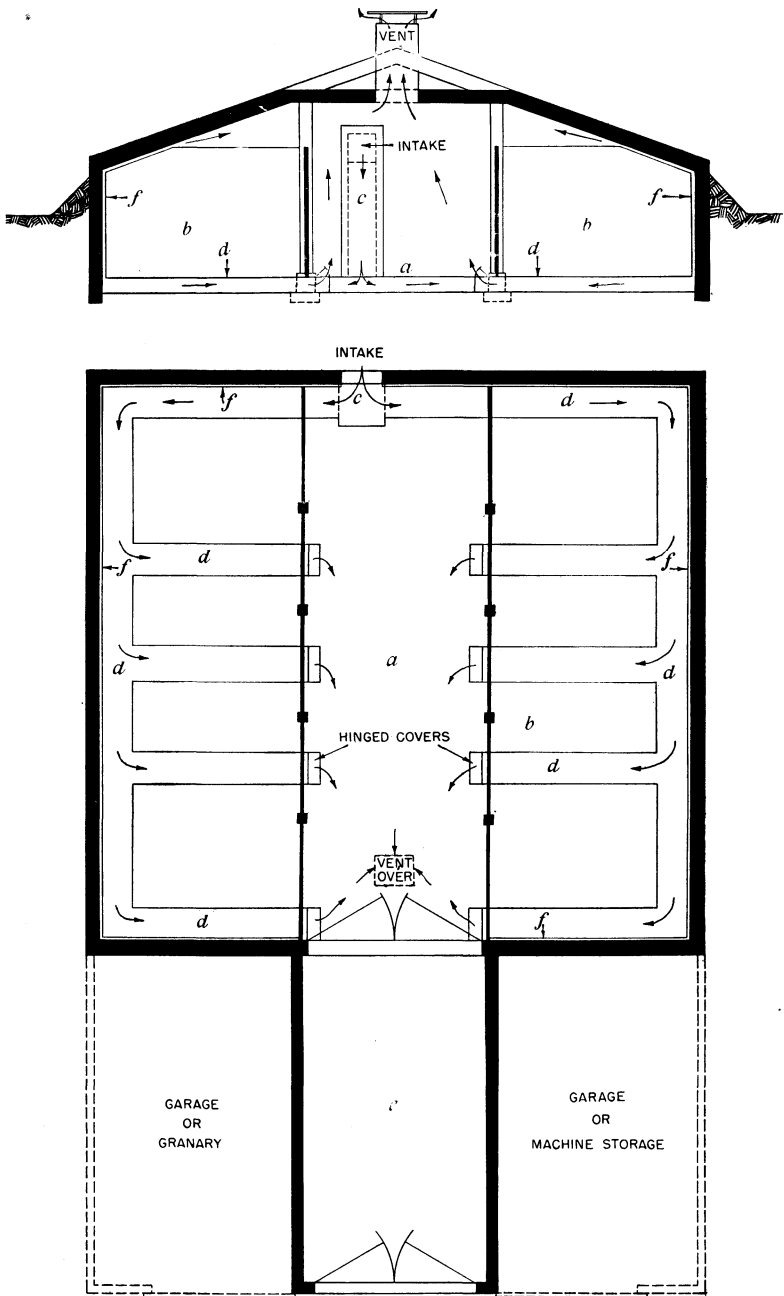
Floor plan and cross section of Nebraska-type 6,700-bushel storage. Exchange Plan No. 5645. The entry ramp (e) and the work alley (a) are often concrete floored, but the bin floor (b) is usually of earth. The intake duct (c) may be controlled by automatic dampers (p. 32). It opens into rectangular floor flues (d) that carry both ventilating and circulating air from alley (a) to the wall air-circulation space (f).
